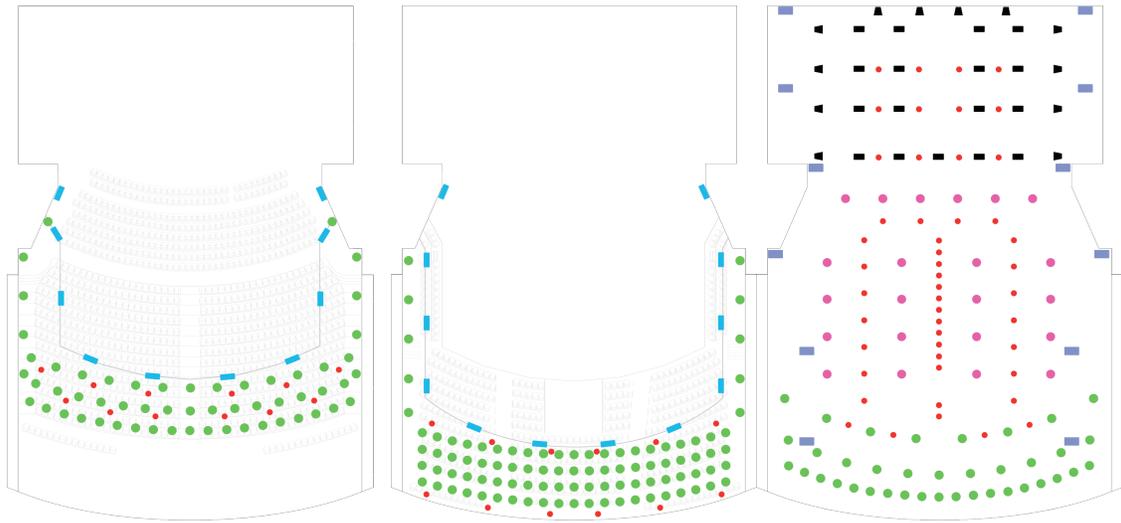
Plan Drawings of Nokia Concert Hall, (from left to right) under-balcony 1, under-balcony 2, ceiling.
